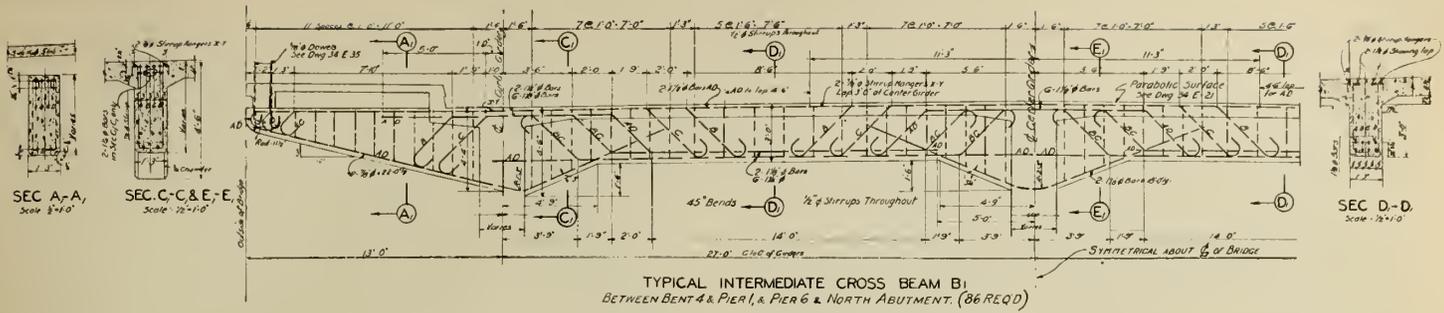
Concrete Viaduct—Typical Cross Beam.
